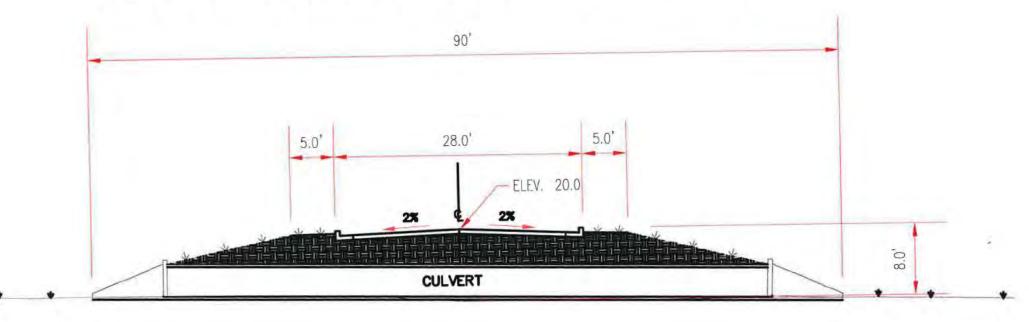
TYPICAL LONGITUDINAL SECTION OF ROAD THROUGH WETLANDS (NTS)
